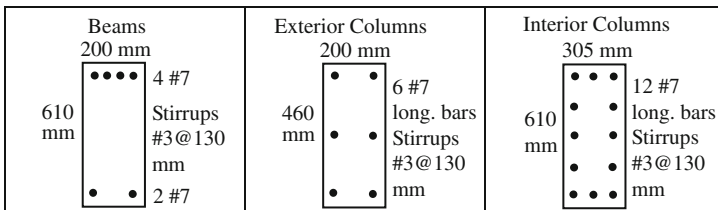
Cross-sections and the reinforcement detailing of the columns and beams for the application 9-story, 5-bay 2D frame structure
